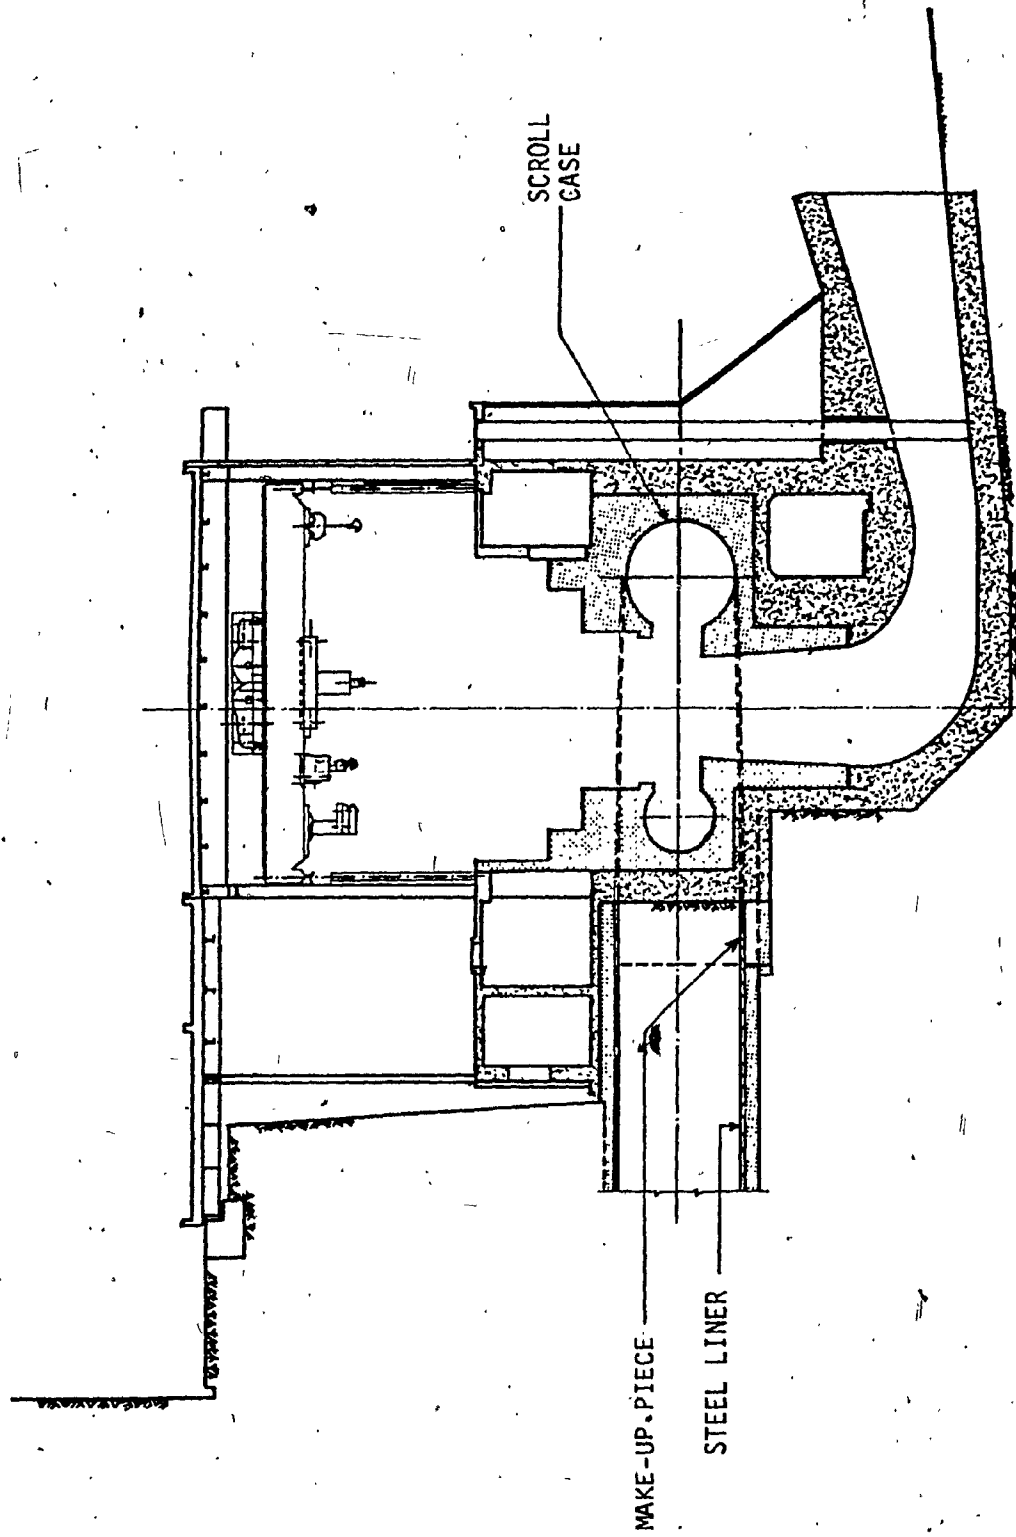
Section through a penstock showing transition between the steel liner and the scroll case.
